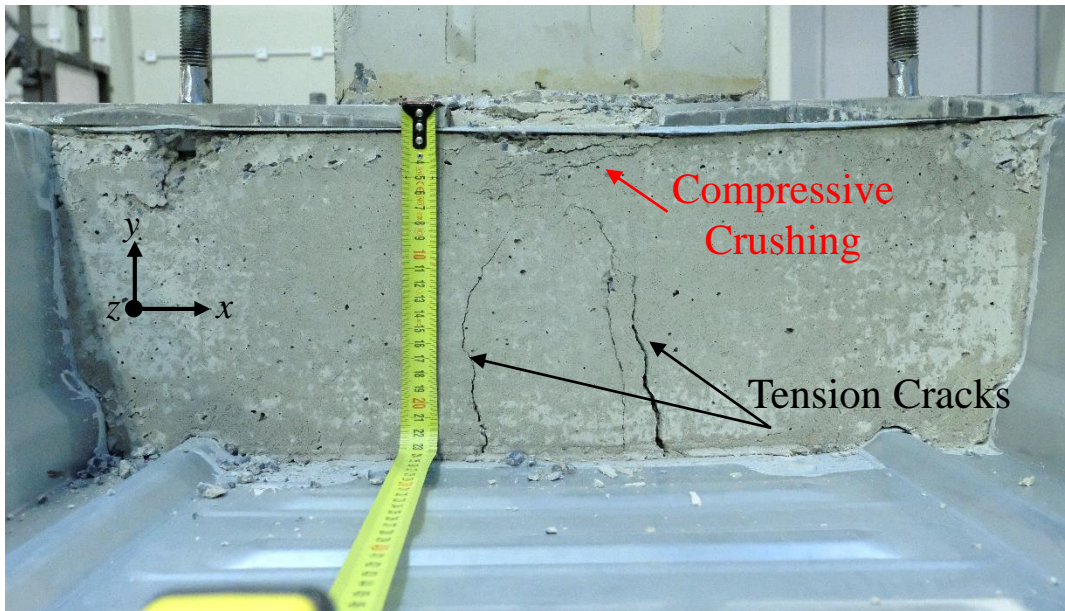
Status of the concrete grout at the mid-span of GJSFB-01 test specimen.
